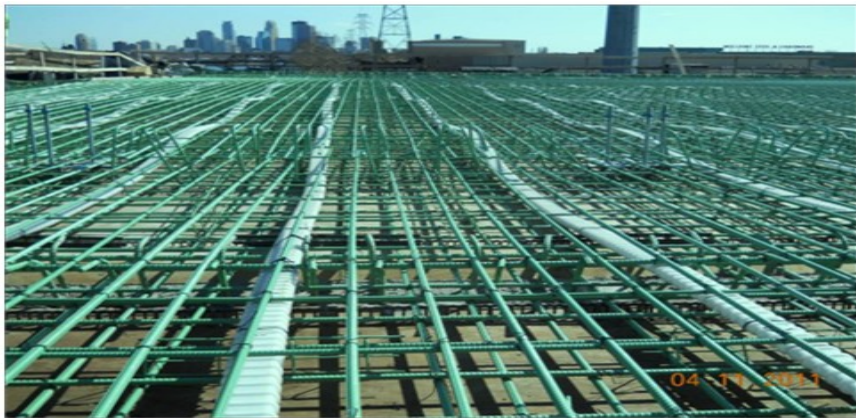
Internal Bonded PT (www.lowryavenuebridge.com)
